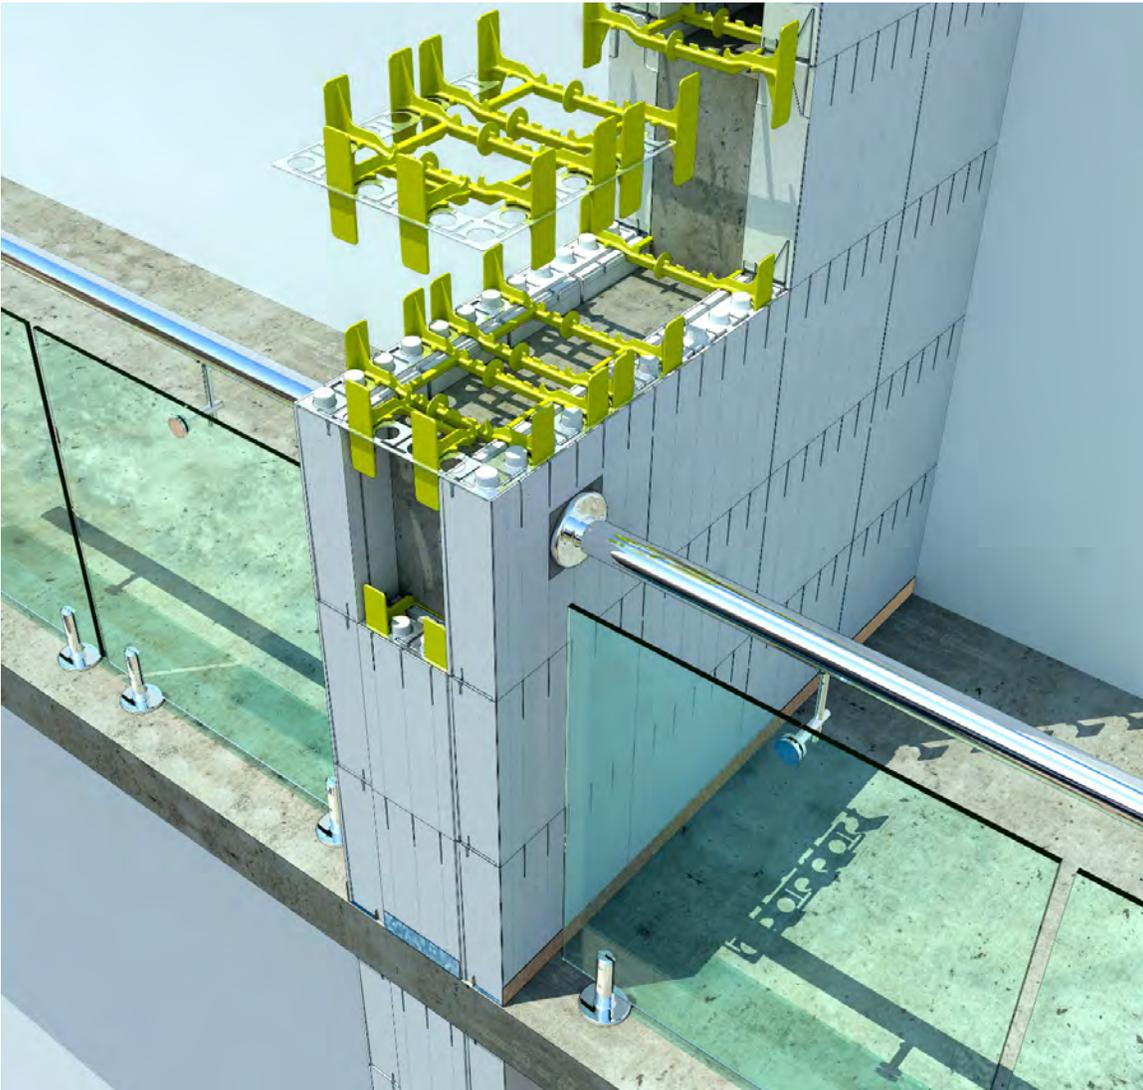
Bulkheads Formed with Quad-Lock End Cap Brackets
